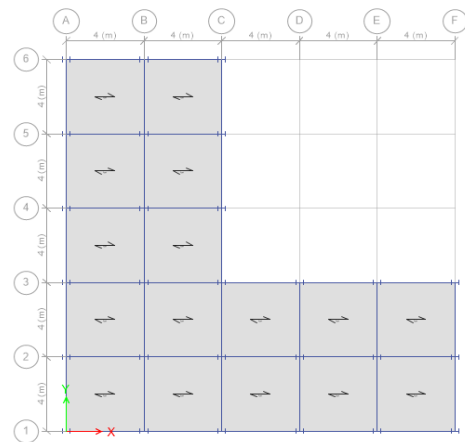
Irregular L-shape building with re-entrant corners Model 2
